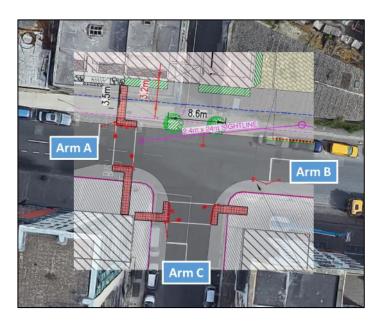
Junction 6 Do Something Signalised Junction Layout
